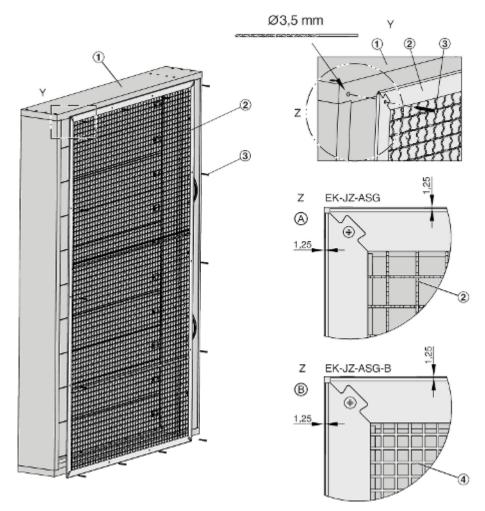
Mounting crimped wire grille or perforated plate grille on EK-JZ
